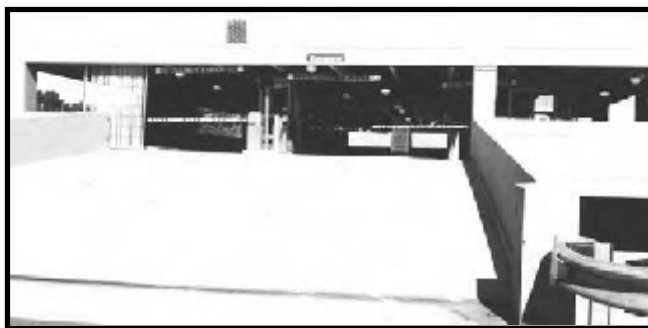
Controlling the entrance and exit of parking areas. One way in and one way out.
